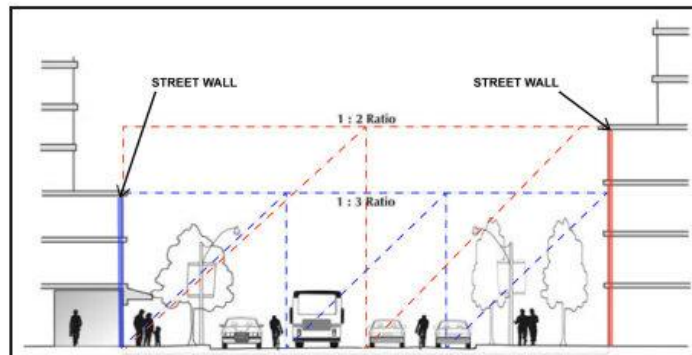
A building height-to-street-width ratio of between approximately 1:3 and 1:2 is recommended to frame streets and provide human scale. Portions of buildings above the street wall are encouraged to step back.
